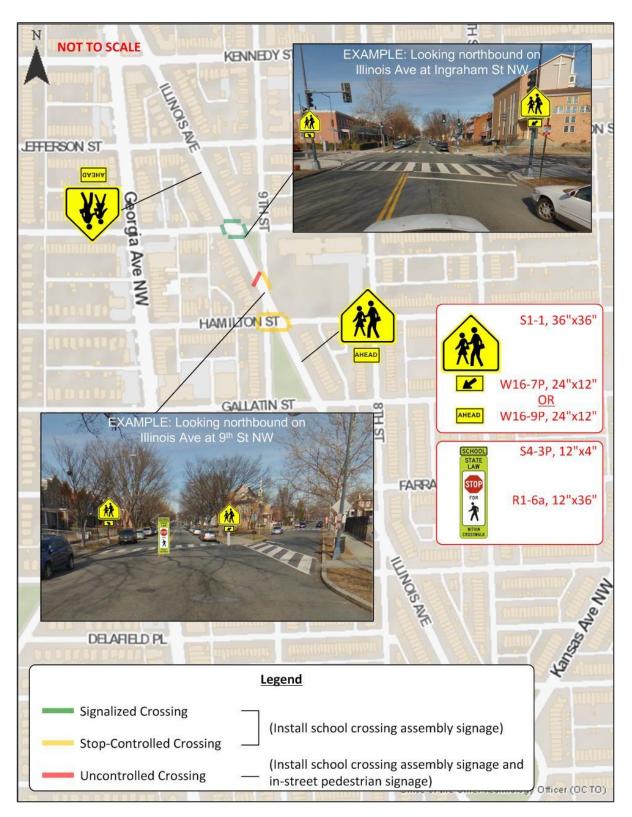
Recommended Improvement – Install School Crossing Assembly Signage
